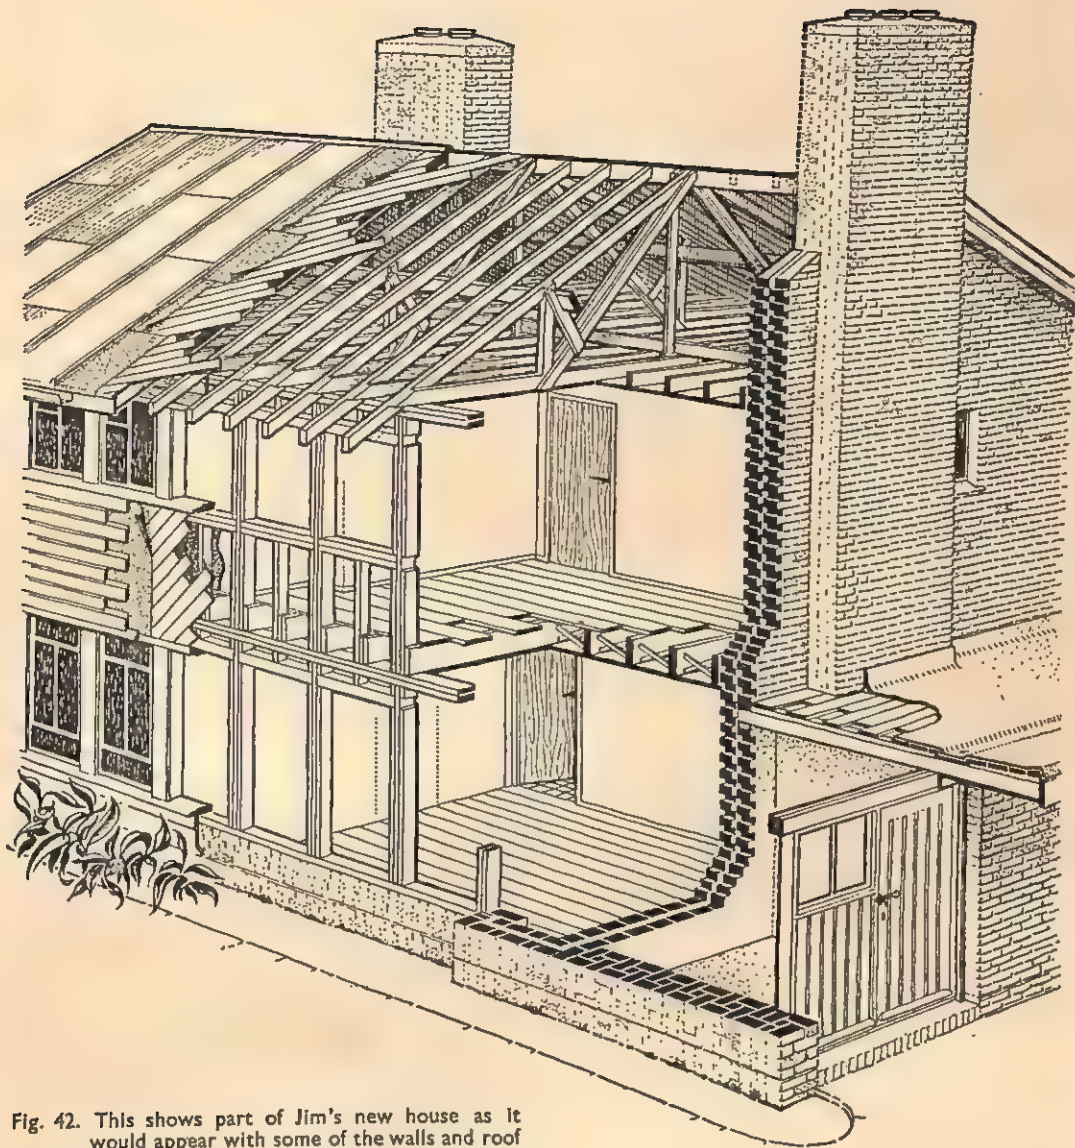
This shows part of Jim's new house as it would appear with some of the walls and roof removed. Compare it carefully with Figs. 40 and 41. Name each room shown. Examine the structure of the roof and the wooden framing for the garden front wall with its many window-spaces. Which of the carpenter's work on these would probably be done on the site, and which in his workshop?
